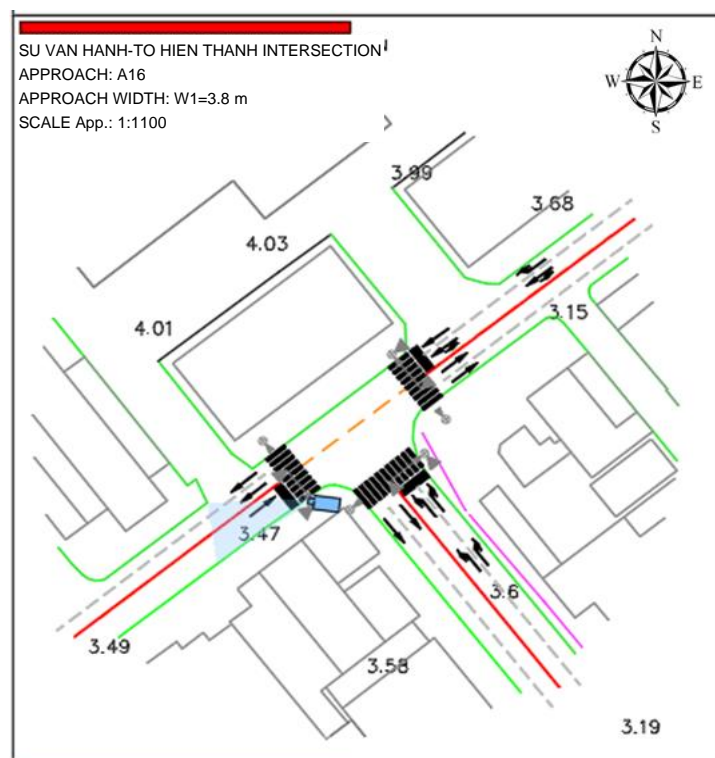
Layout of Su Van Hanh-To Hien Thanh Intersection
